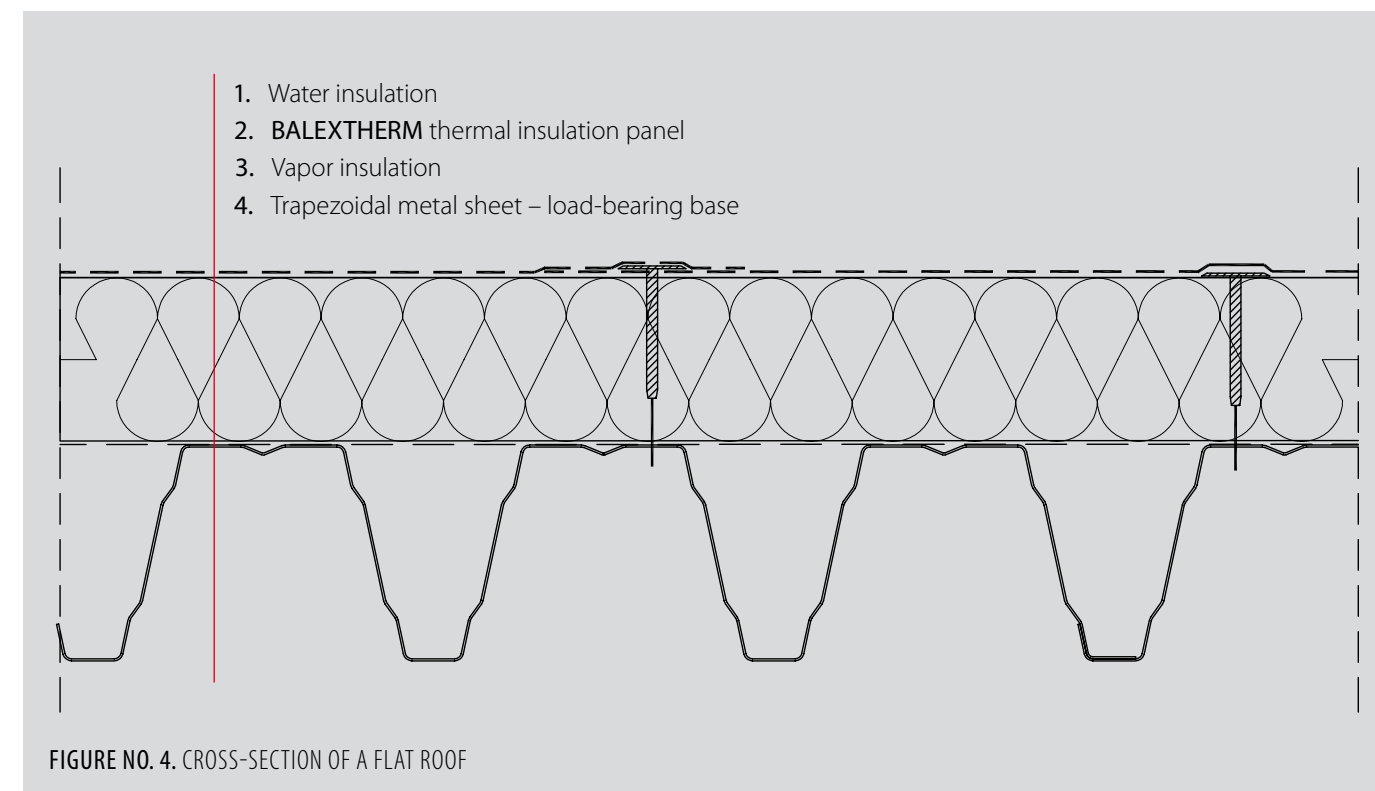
CROSS-SECTION OF A FLAT ROOF
